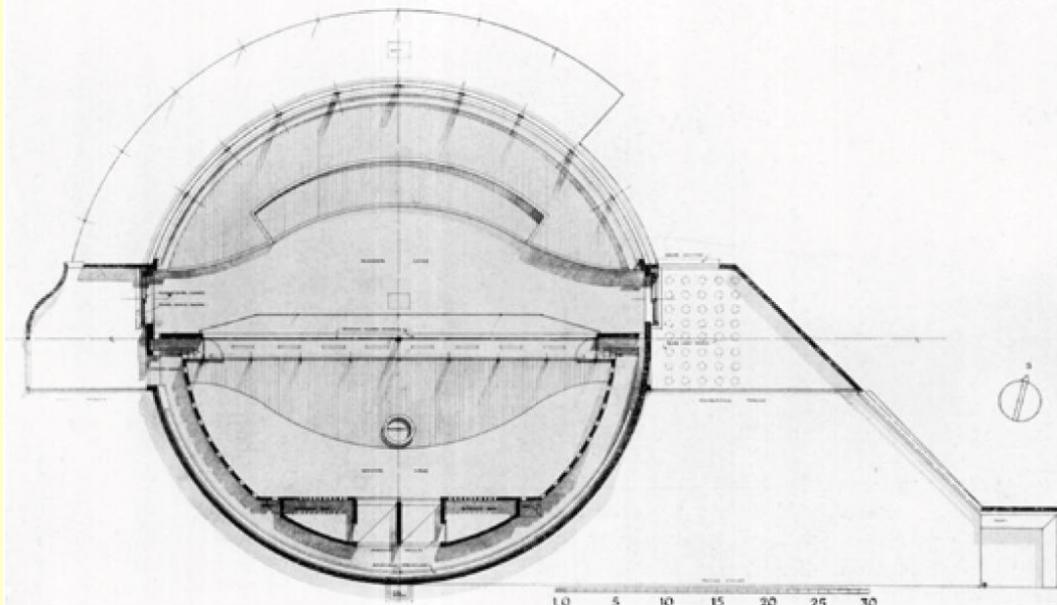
Plan of the Gorilla House (*Gorilla House, London Zoo, 1934*).
